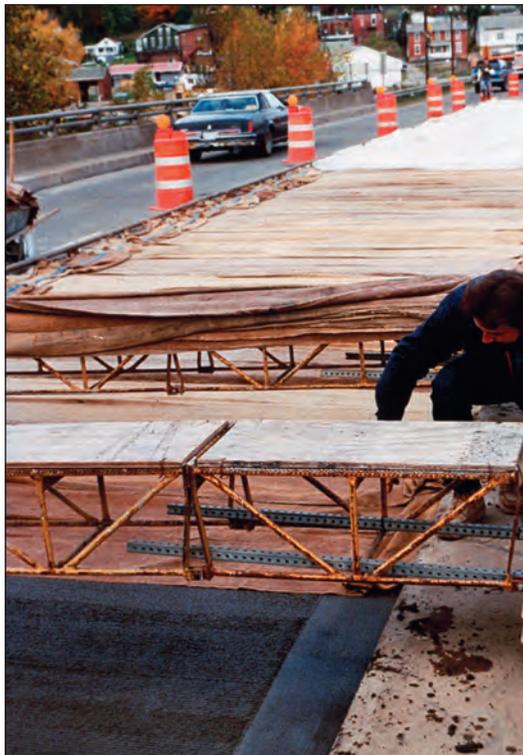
C. Wet curing using burlap and plastic sheeting applied to a silica-fume concrete bridge deck during a single lane placement.
